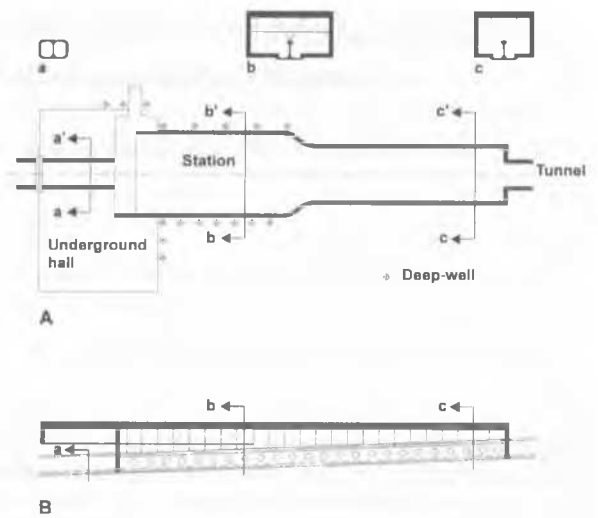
Ground-plan (A) and longitudinal section (B) of the new station with the position of the deep-wells.
